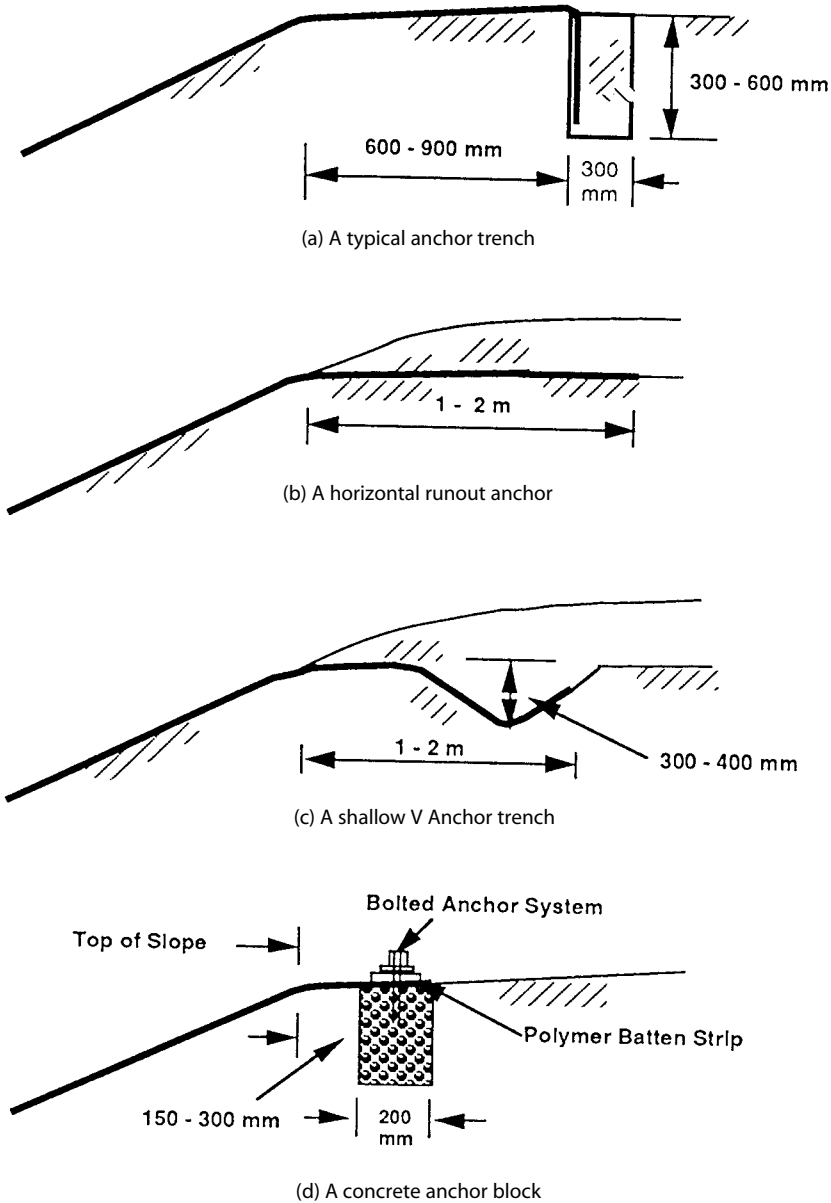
Various Types of Geomembrane Anchor Trenches. Dimensions should be varied for site-specific conditions.
